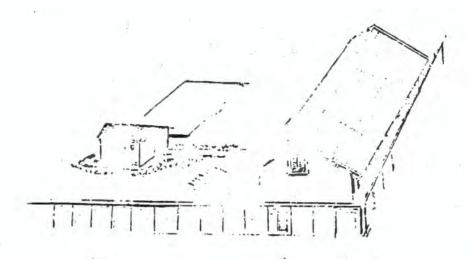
Buildings 4 and 5E, building foundation 6, and portions of the south and east walls.
